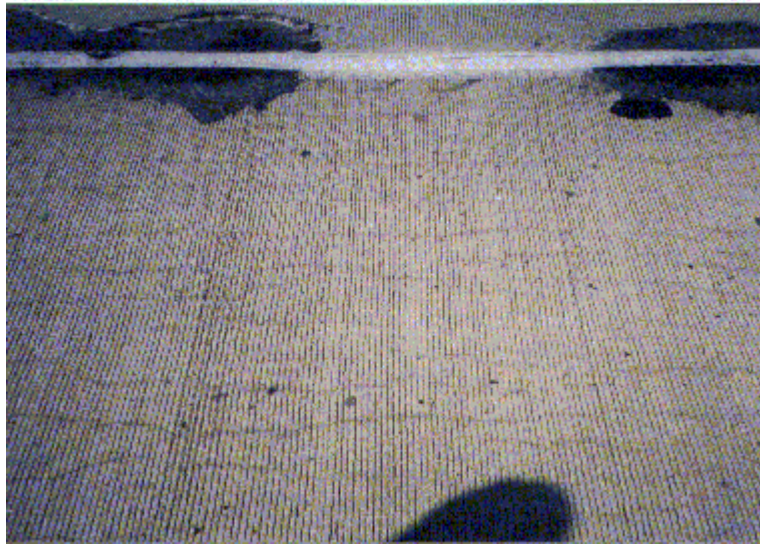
Typical longitudinal cracking and example of asphalt patching along joint between shoulder and travel lane (Newark, DE).
